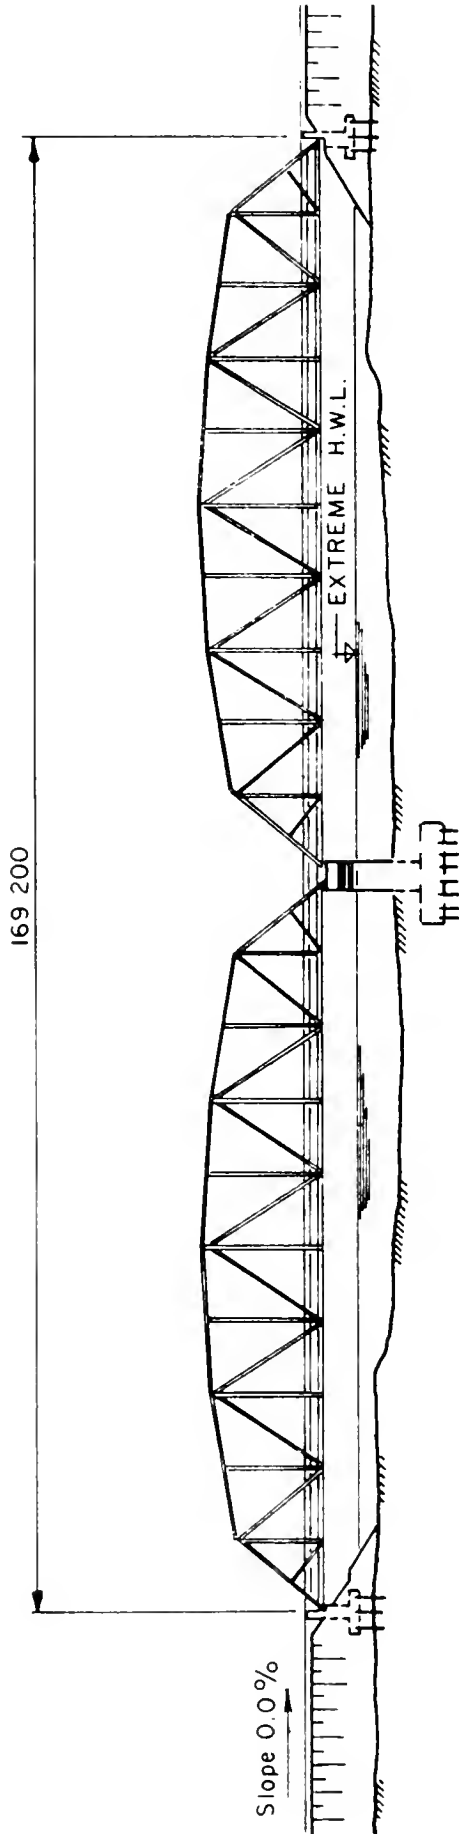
ELEVATION - PARSNIP RIVER BRIDGE
